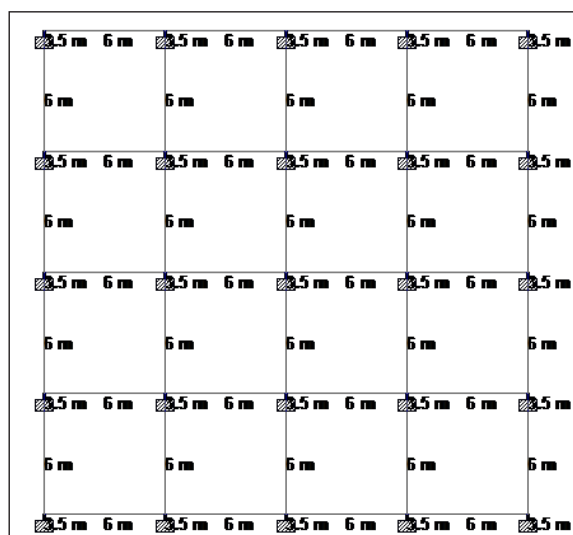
Structural Framing Plan of the Proposed 10 Storey Steel Building
